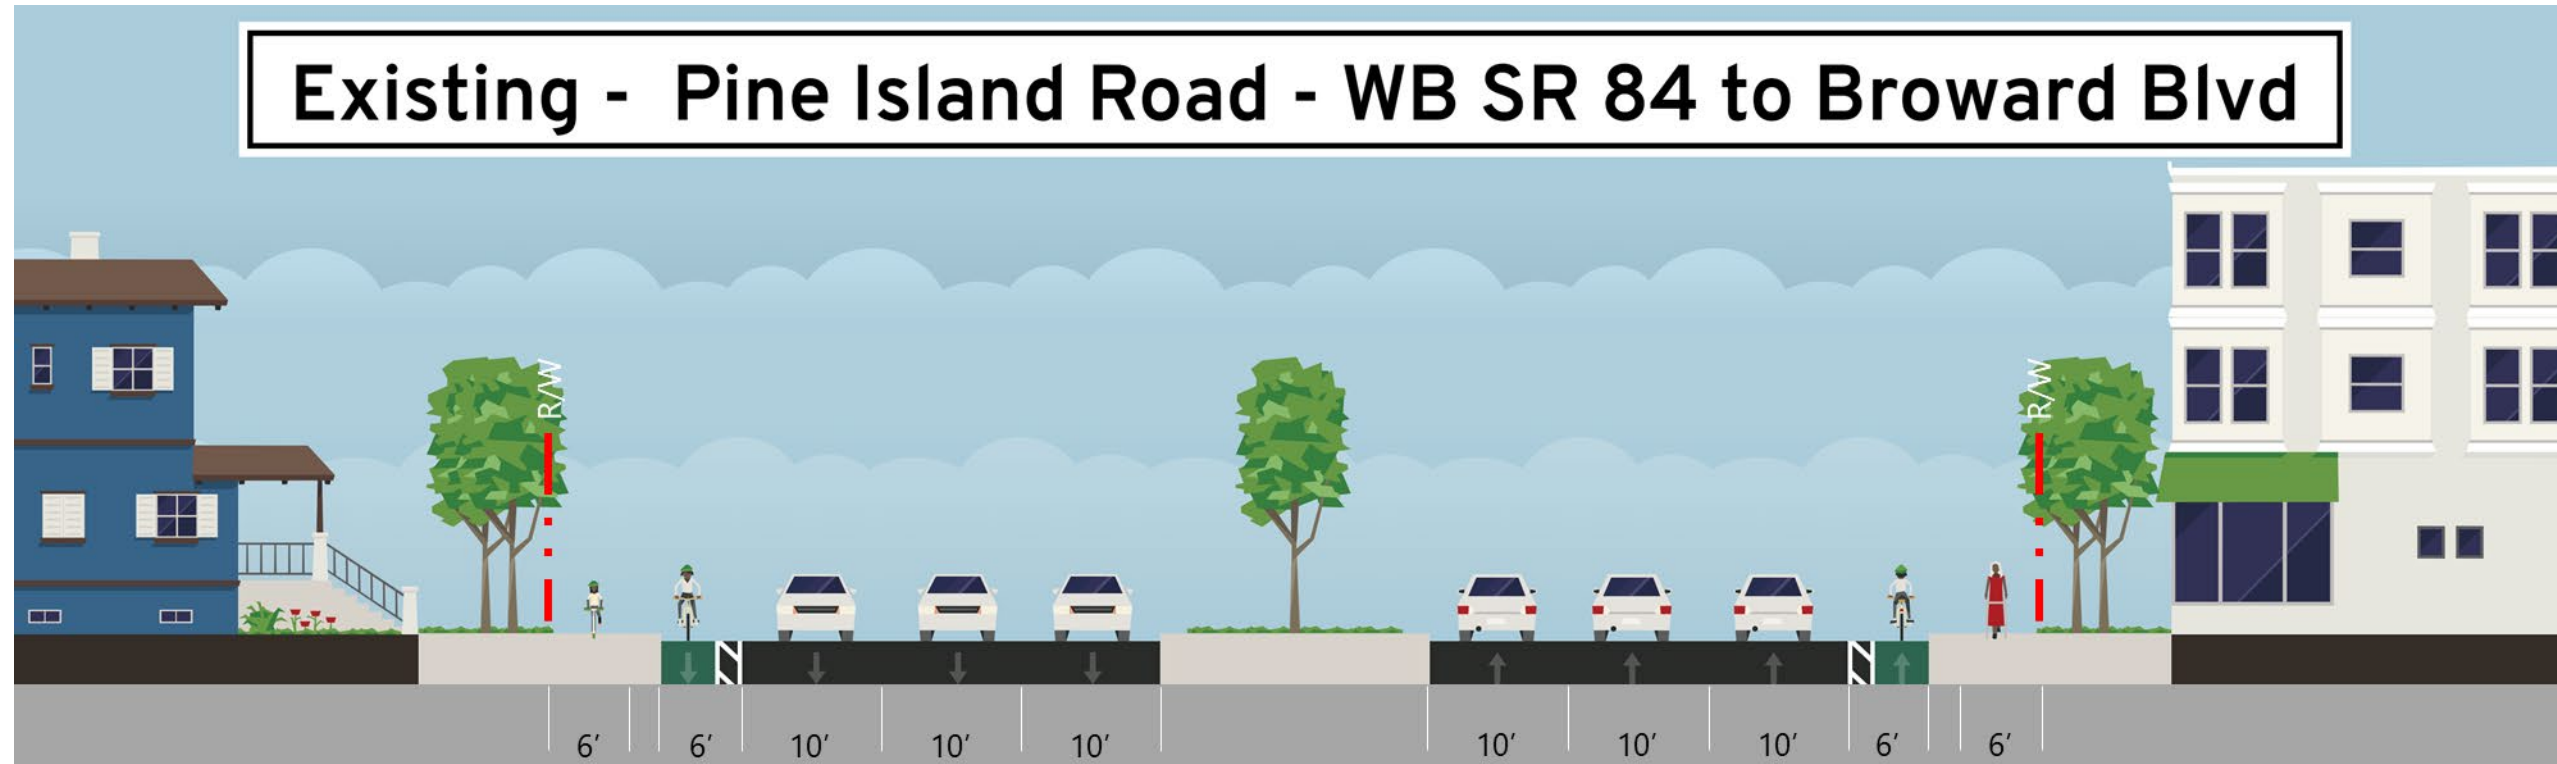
depicts the existing conditions typical section for Pine Island Road north of SR 84. No changes are recommended for this section of Pine Island Road. Adequate roadway, pedestrian, and bicycle facilities are provided.
